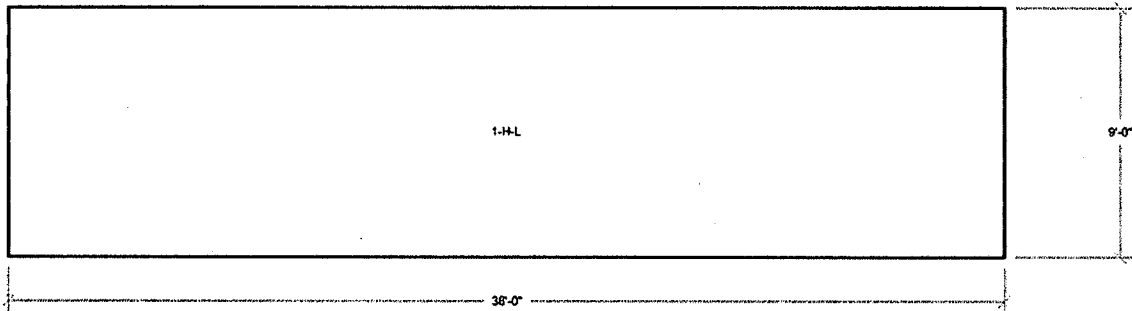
H.7-12: Tunnel Walls Looking From Outside Horizontal Reinforcement Zones Far Side Face
